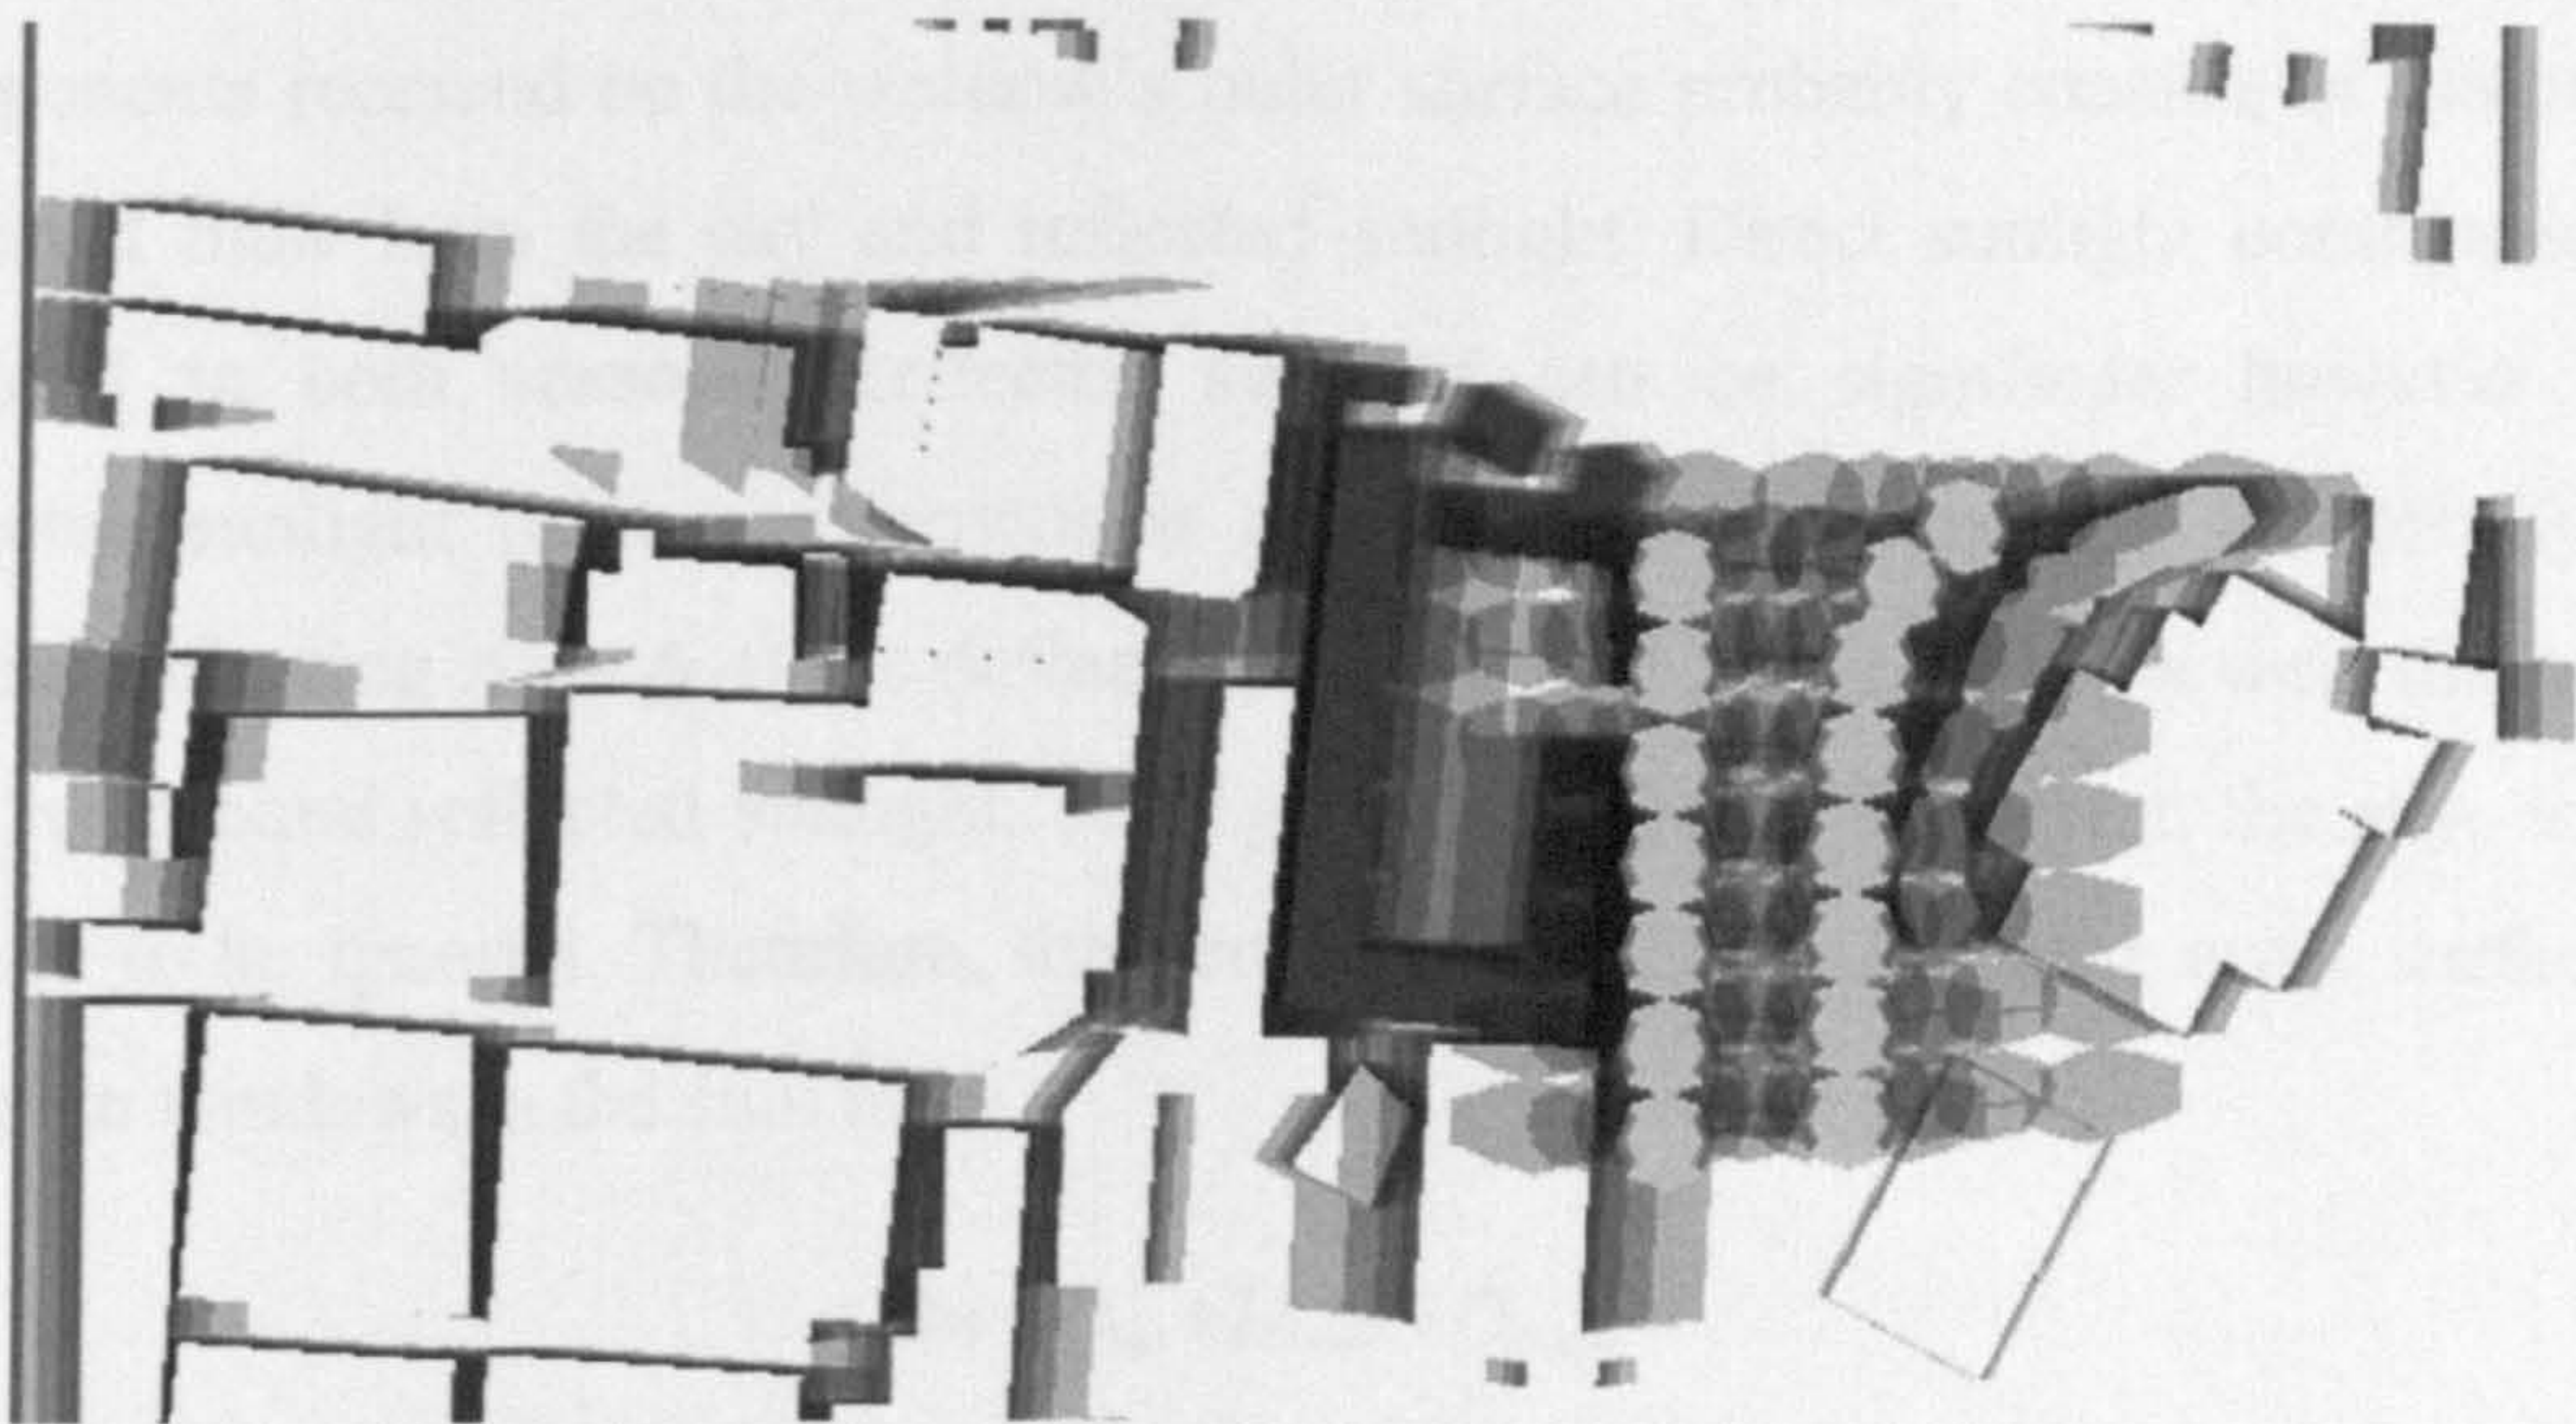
Truong Cong Dinh School's site section showing main obstructions.
